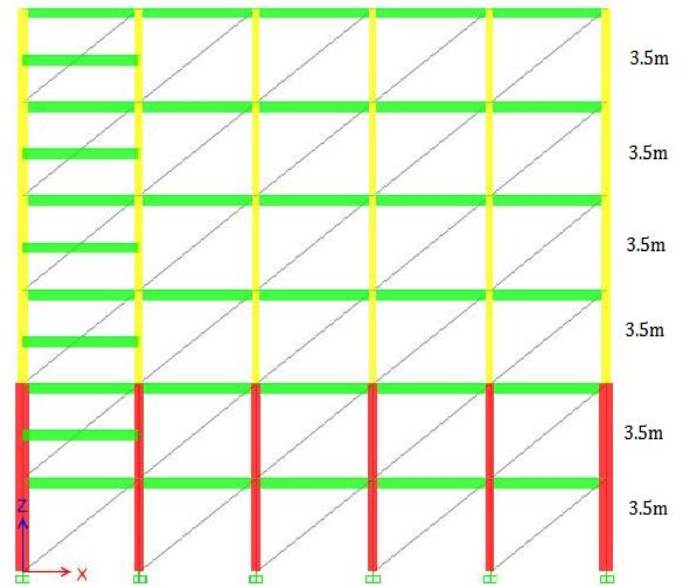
Elevation of the building With floating columns and masonry infill walls.
